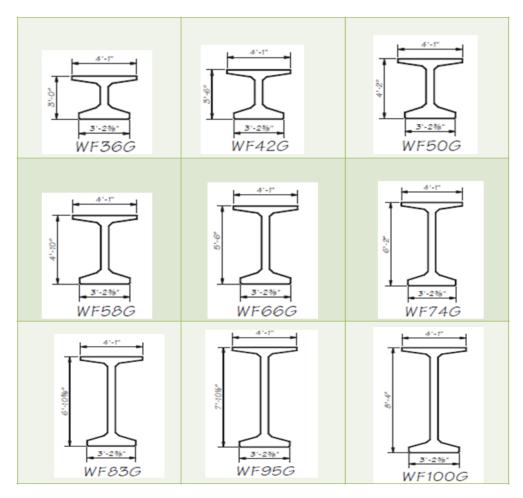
WSDOT Wide Flange Precast Pretensioned Girder types
